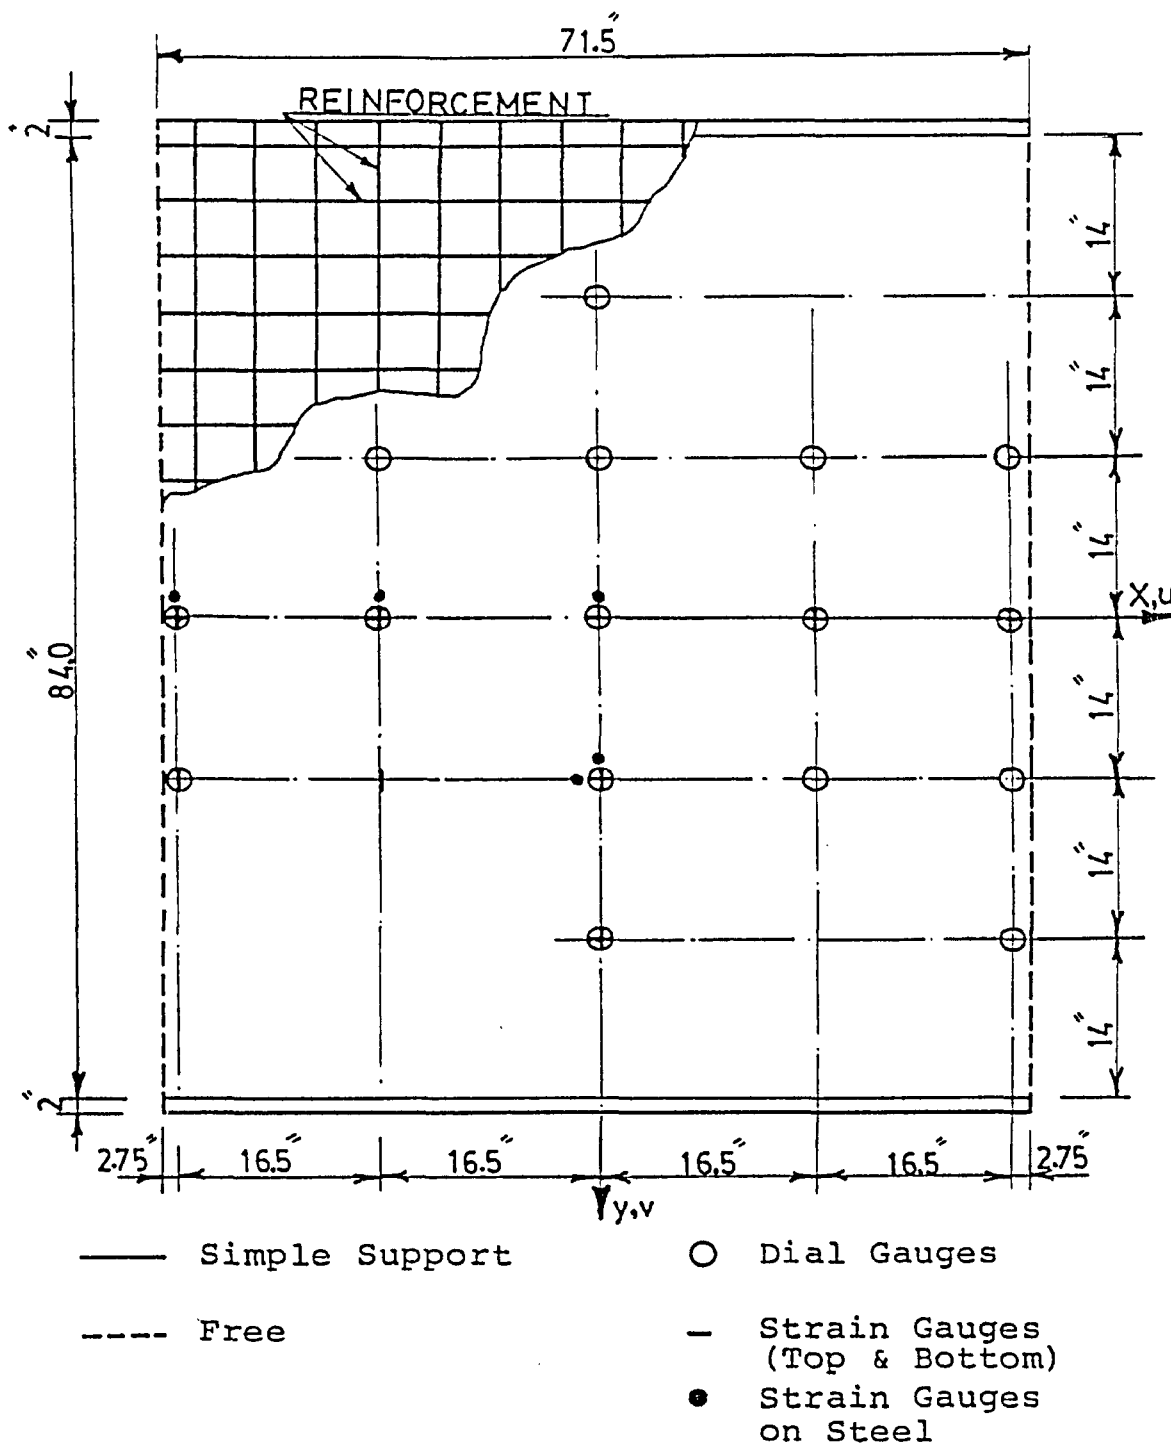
REINFORCED CONCRETE WAFFLE SLAB A.2.
